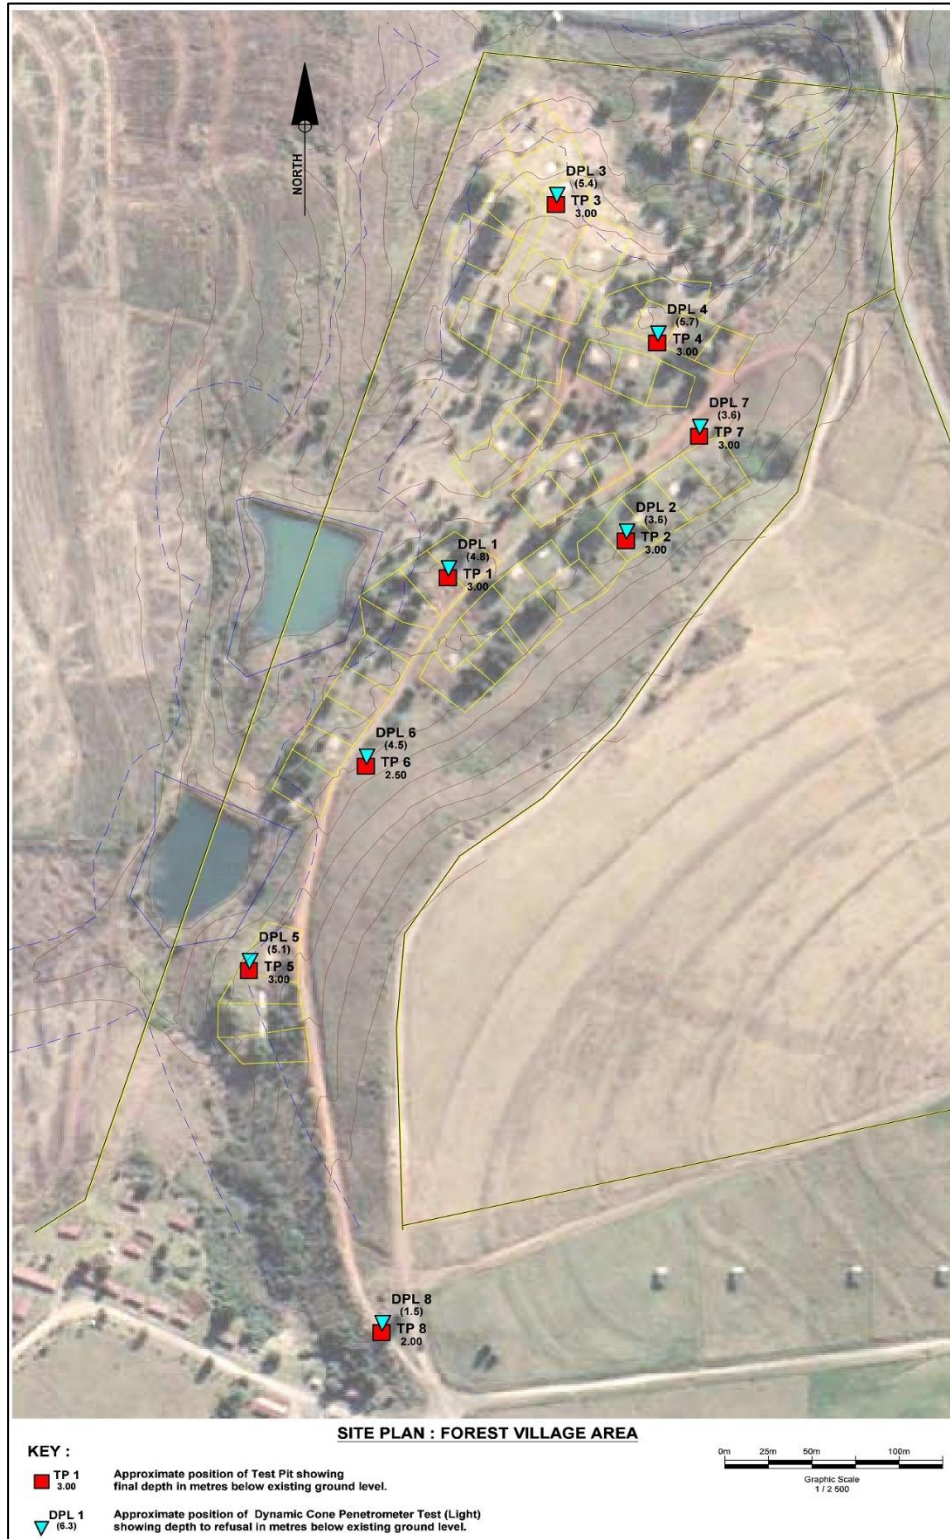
Site Plan showing test pit and DPL test positions in the Forest Village Area
